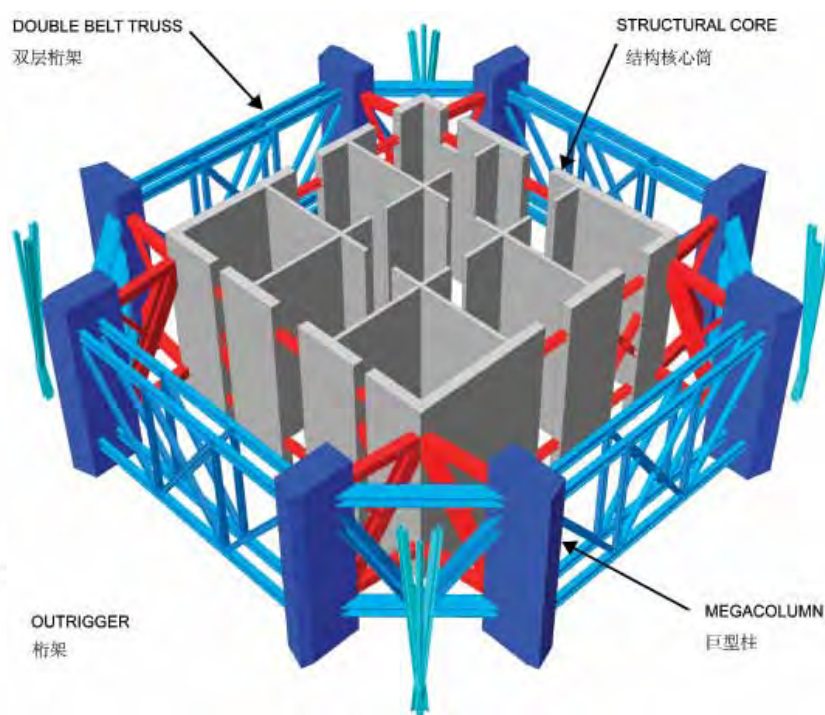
Section of outrigger mechanical level. (Source: Thornton Tomasetti)
